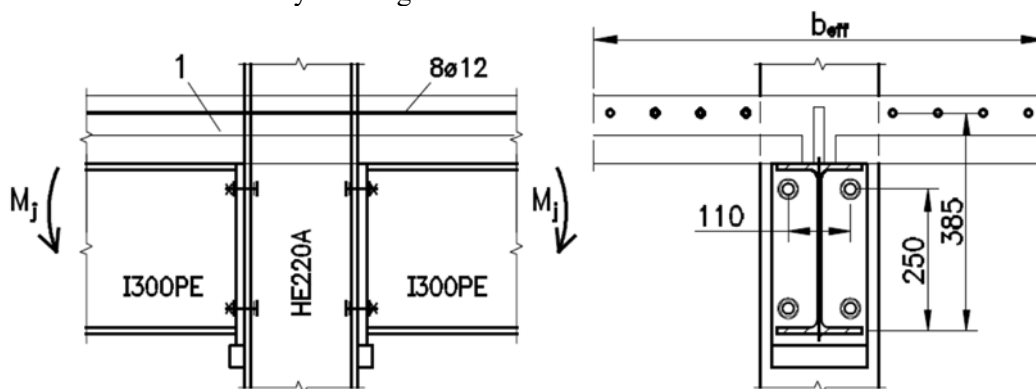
Analysed joint; 1 – composite concrete or steel-concrete slab
